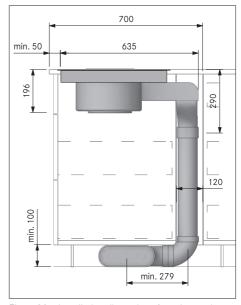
Installation dimensions for exhaust air, worktop depth 700 mm
